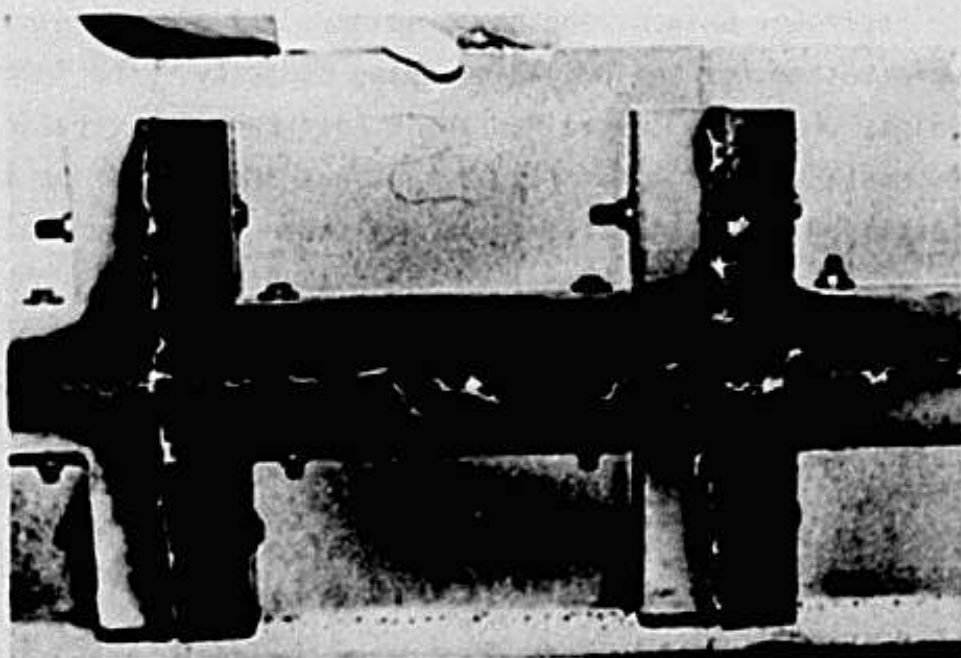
SEGMENT PAIR 2 AFTER FIRE TEST
